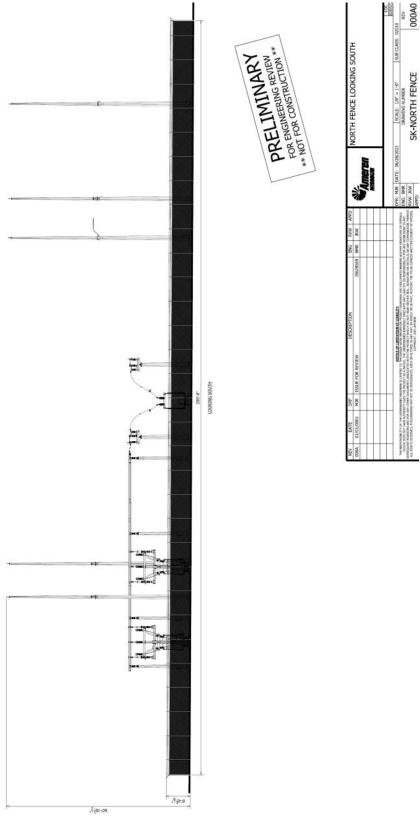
EXHIBIT C: SECTION VIEWS, 2 (NORTH FENCE LOOKING SOUTH)
